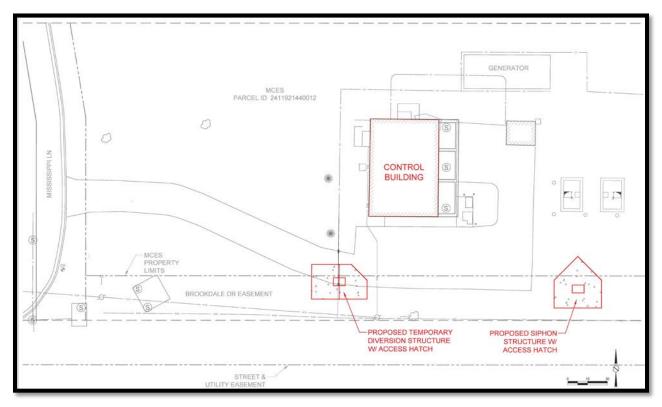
Site Plan for Alternative 3 - West Side Facilities
